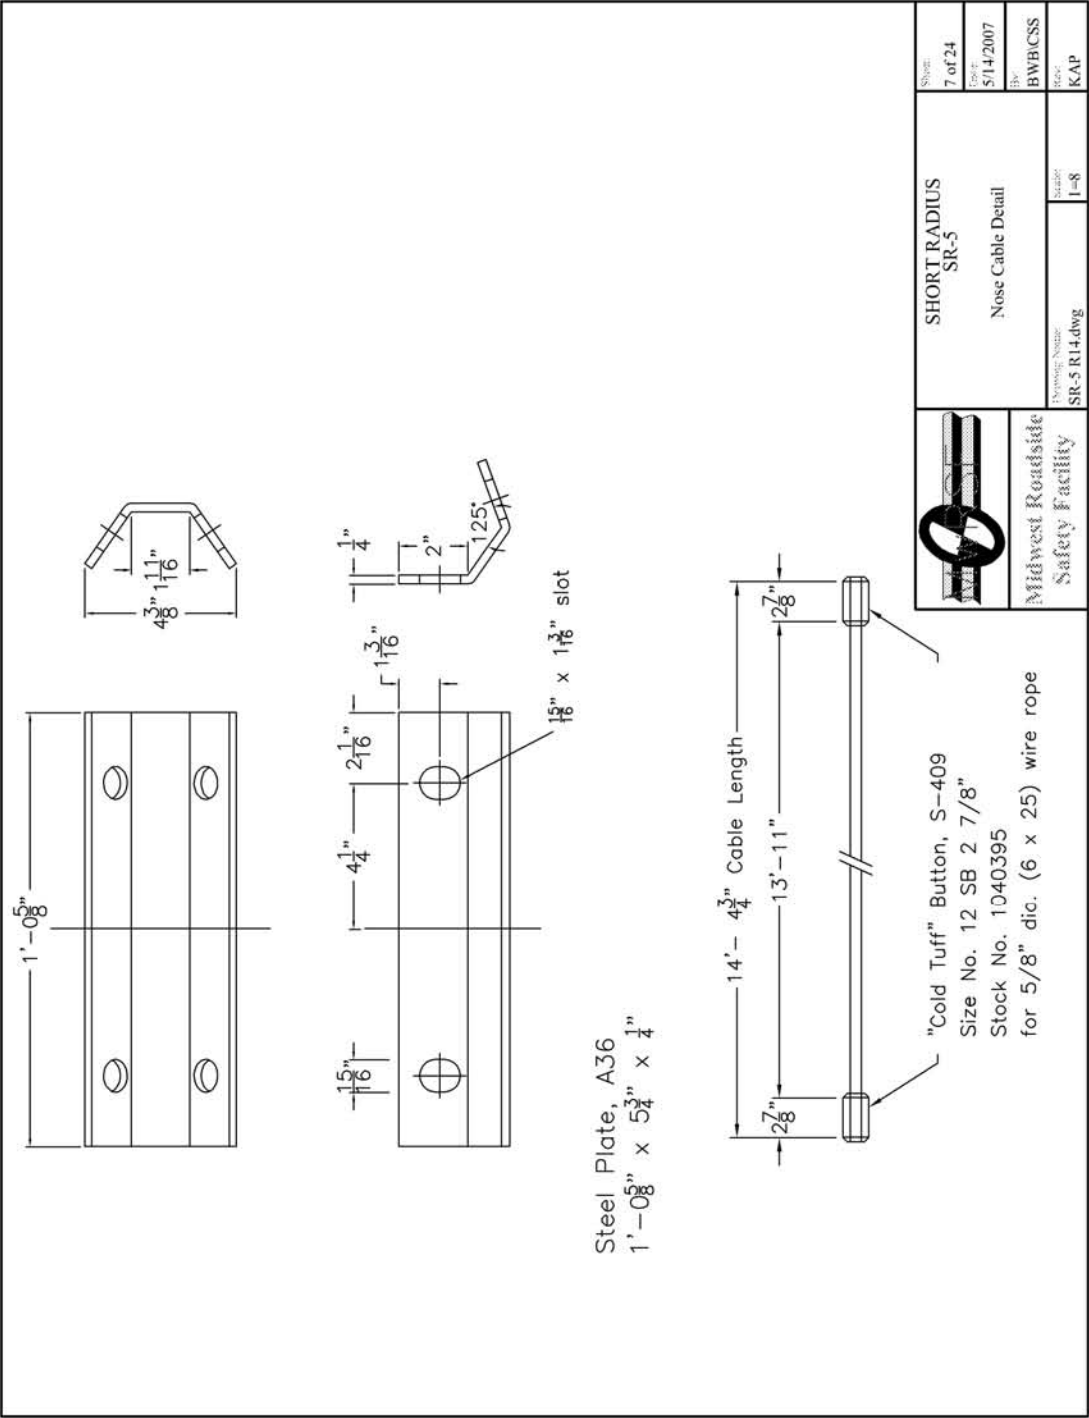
Nose Cable Anchor Plate Details (English), Test SR-5
